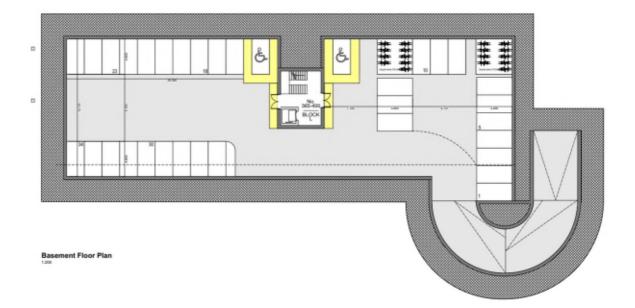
Proposed Basement Car Parking Layout (Delphi Architects drawing no. D1408-19-PA03)
